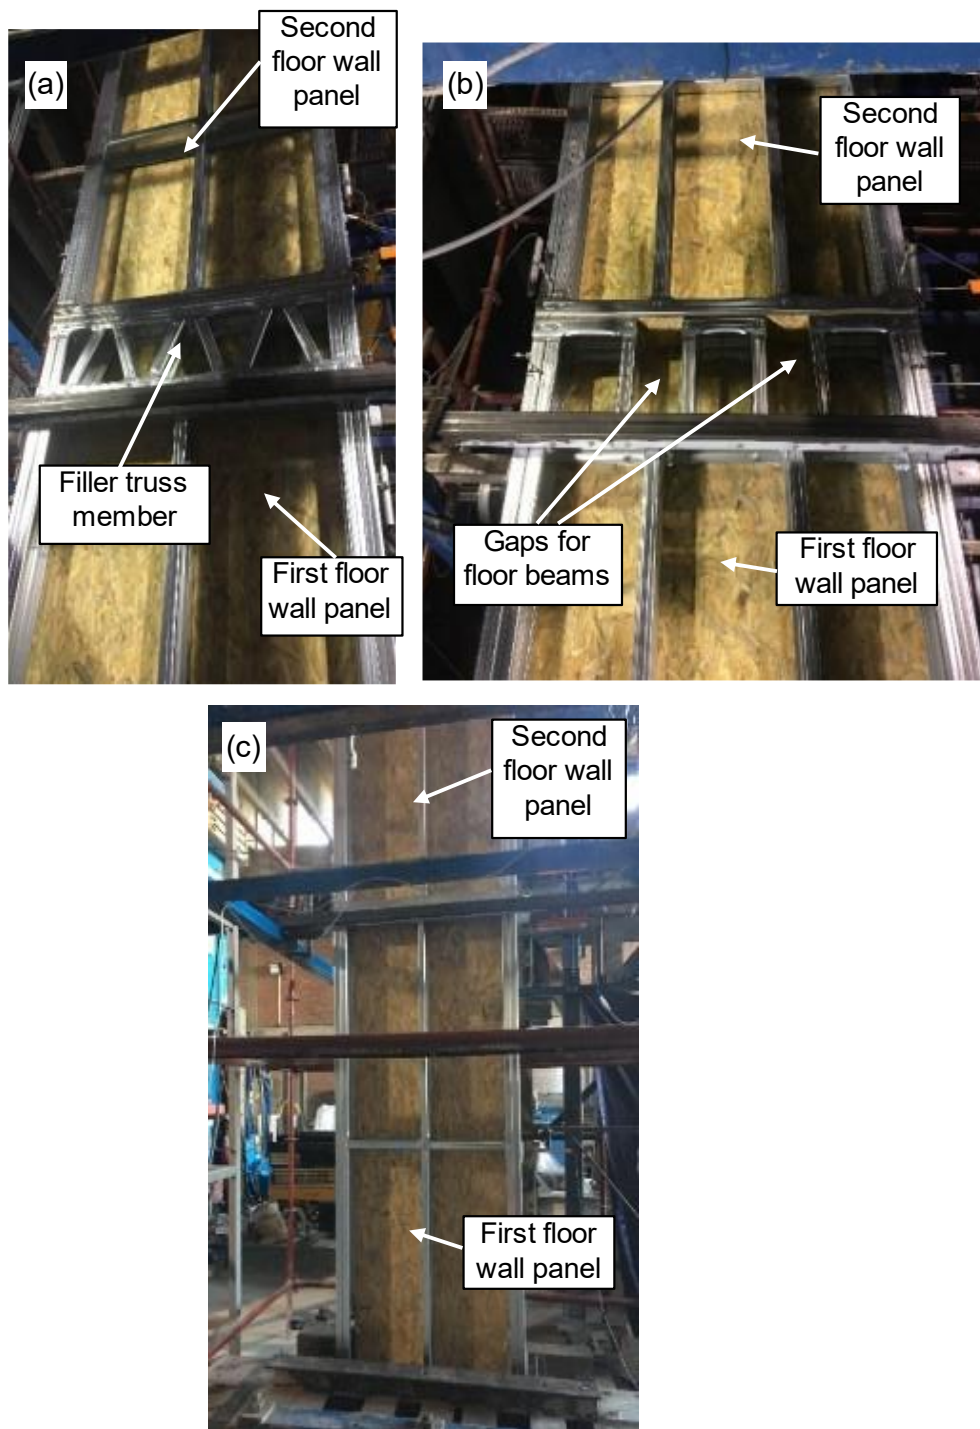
Framing details of wall specimens: (a) platform framing detail-1; (b) platform framing detail-2; (c) ledger framing detail
